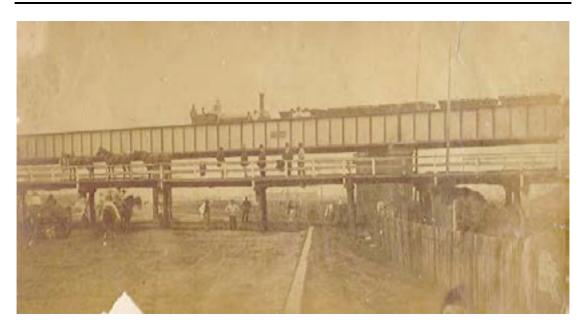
The Opening of the AA Company's new bridge across Hunter Street, 1863. This photograph shows the low level timber bridge before demolition and the new upper level steel bridge.
